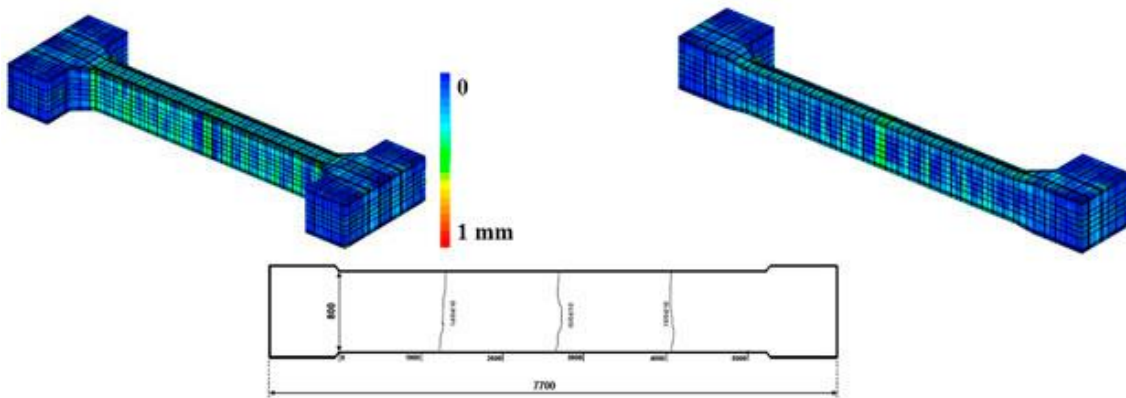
Crack pattern (Buffo-Lacarrière et al., 2014)
